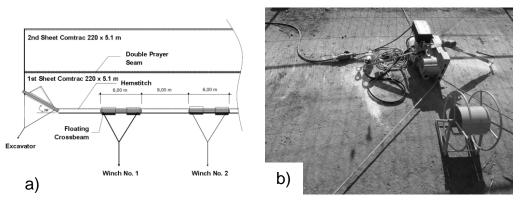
Electric winch of 10 kN tensile force, connetcion of panel to winches.
